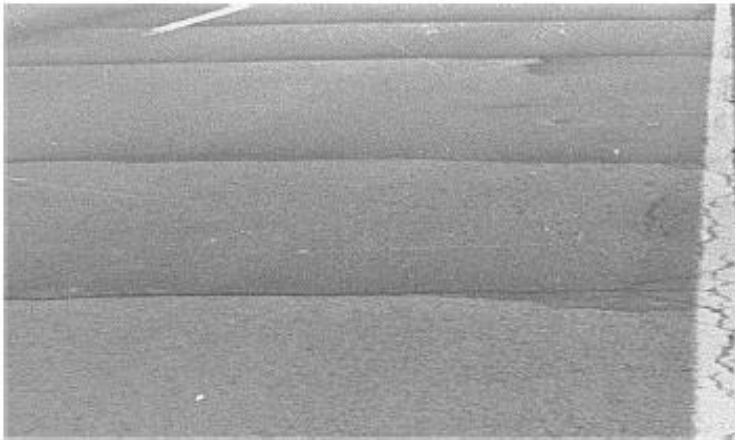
Example of reflective cracking in an overlaid jointed concrete pavement.
